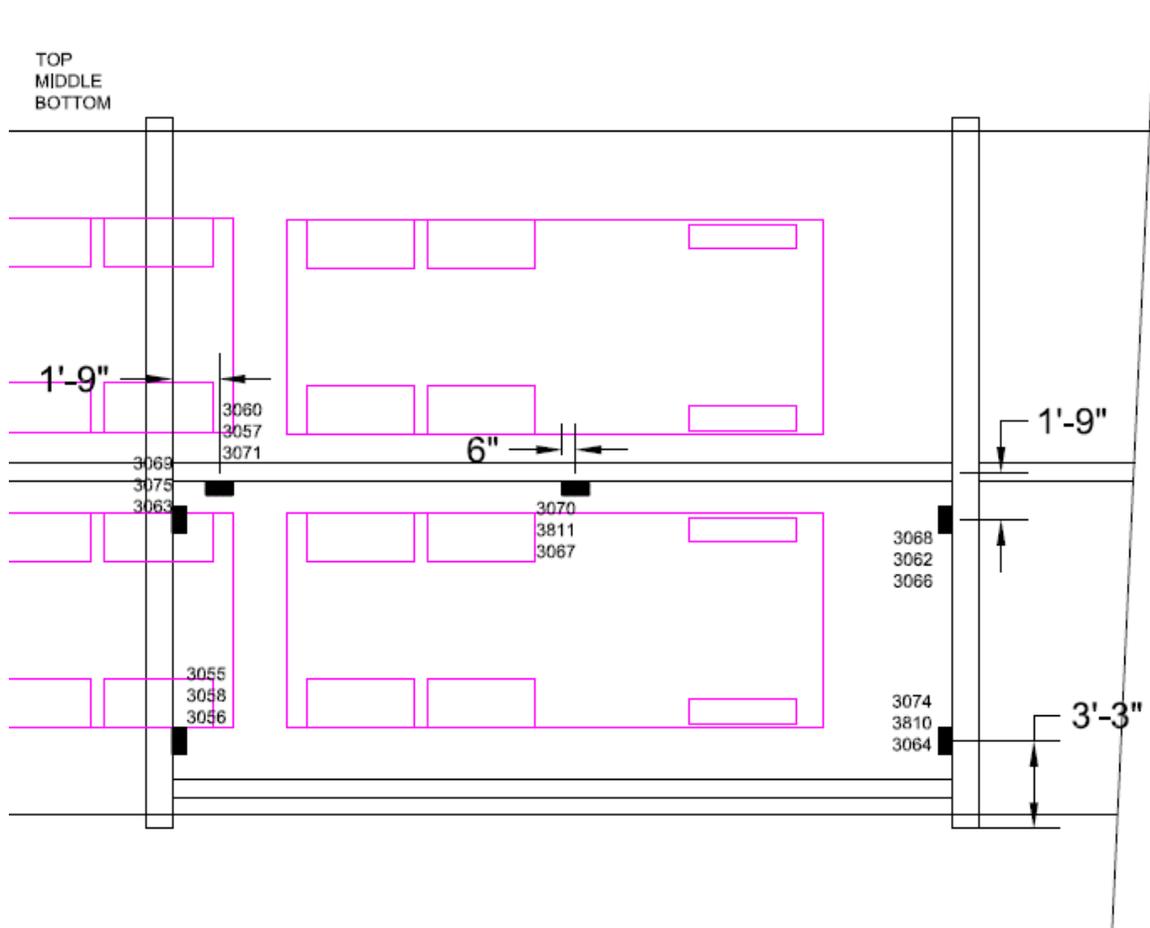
Gage locations for Bridge No. 3790 in Chester, ME
